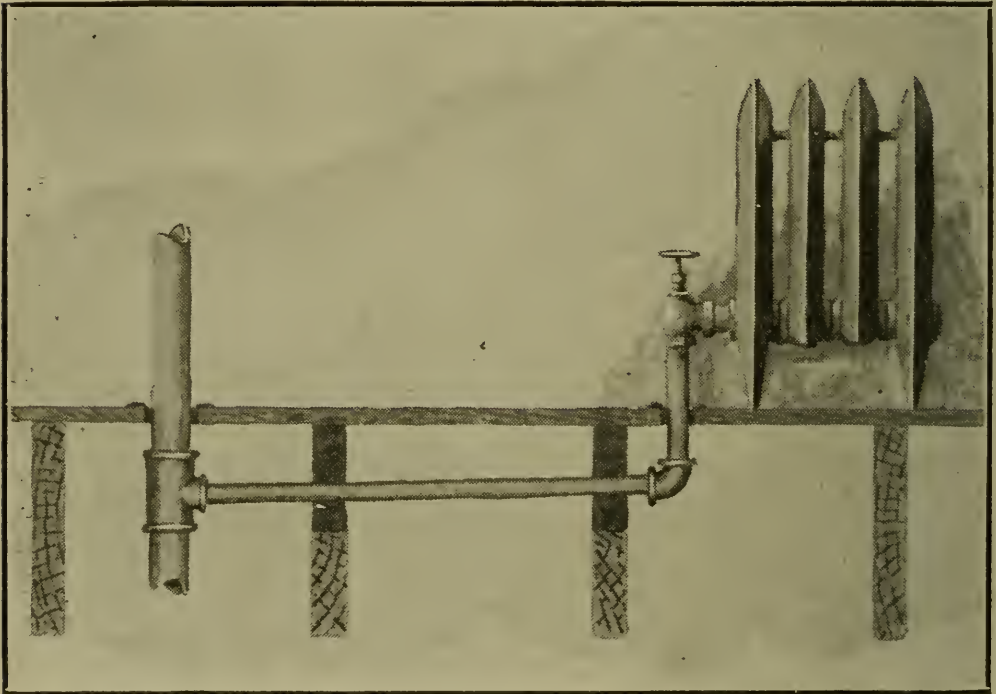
Similar to Fig. 3, with position of radiator changed.
